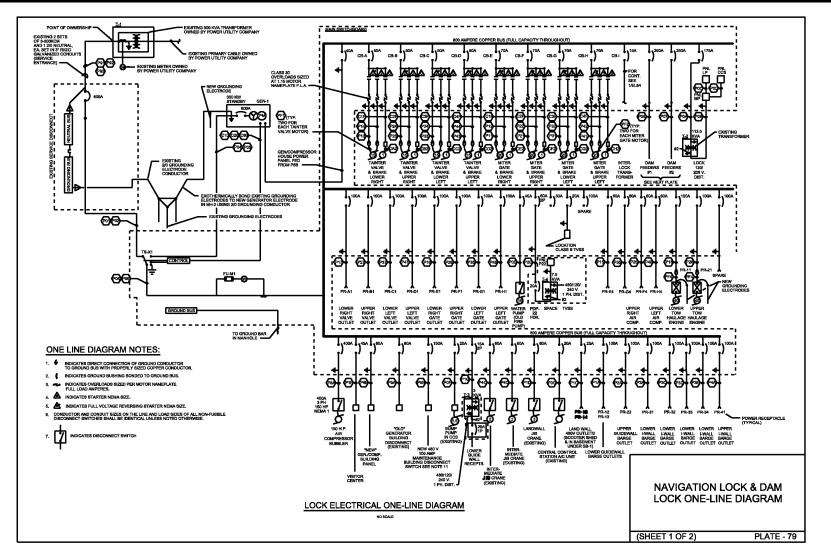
Plate 78: Navigation lock & dam, lock one-line diagram (sheet 1 of 2)
